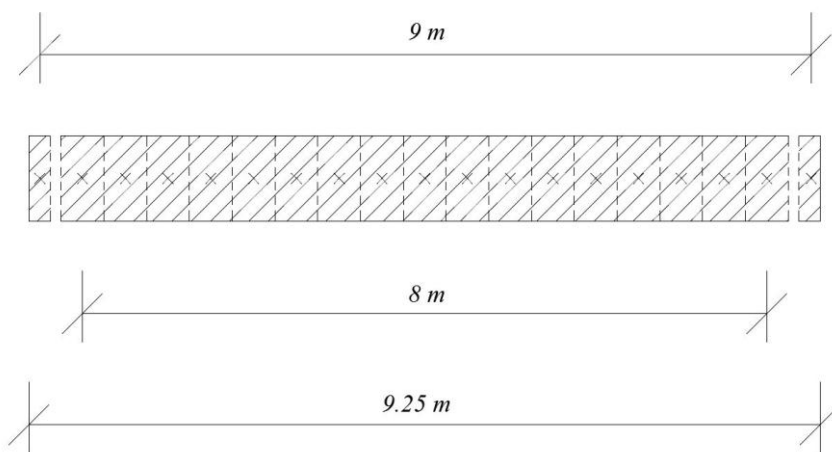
Cross-section of a slab modelled with modified edge beams.
